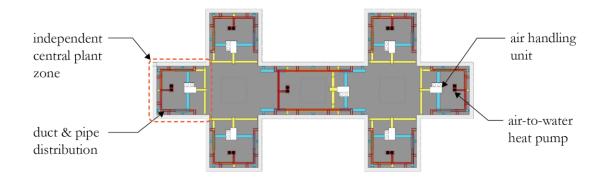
Roof plan showing central equipment divided into zones for a large building footprint.
